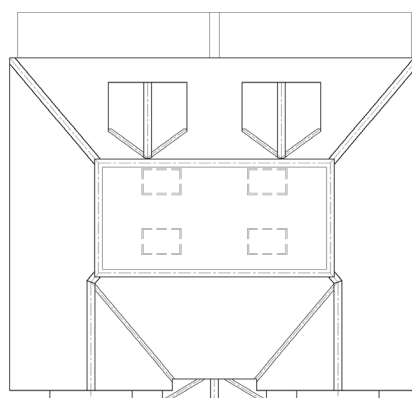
Units 1-2 on Proposed site plan – observed 45 degrees
